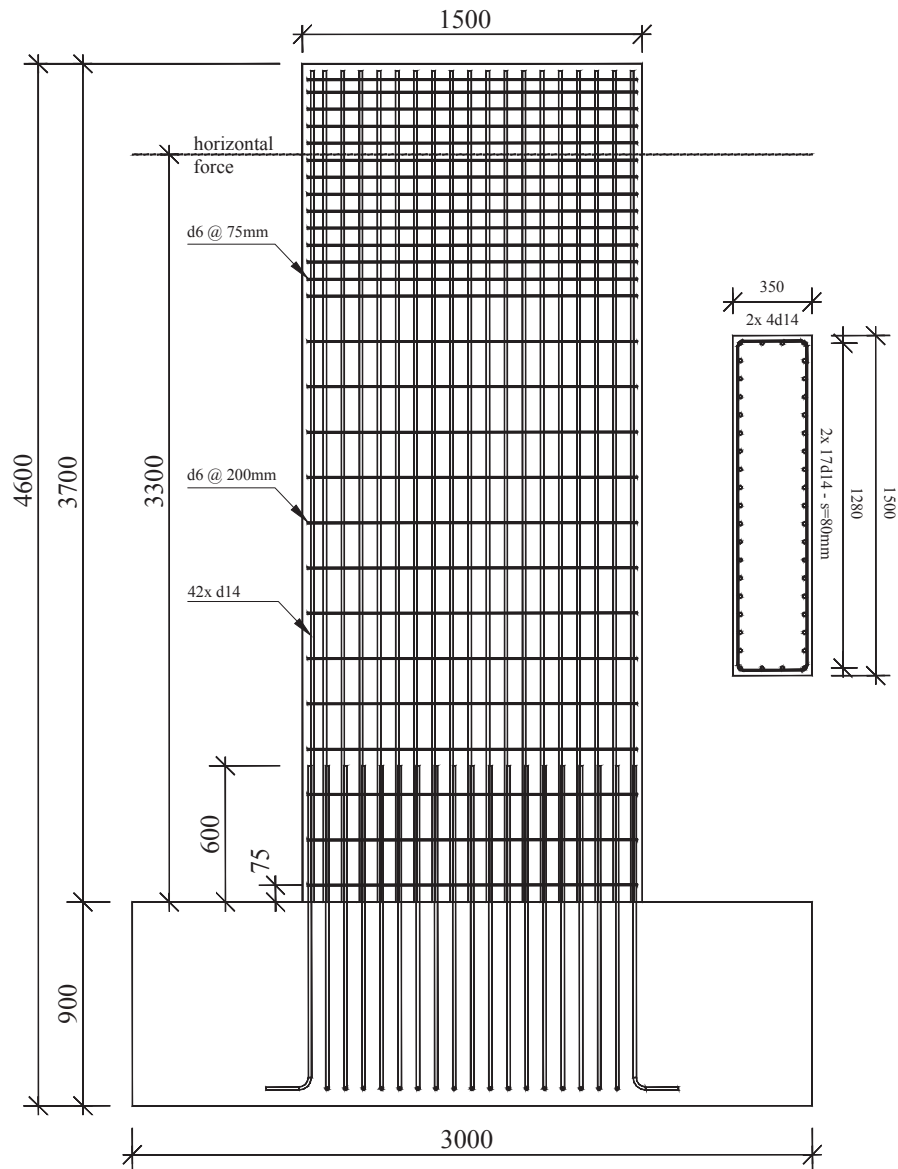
Reinforcement layout - elevation and cross section of test unit VK4. All dimensions in [mm].
